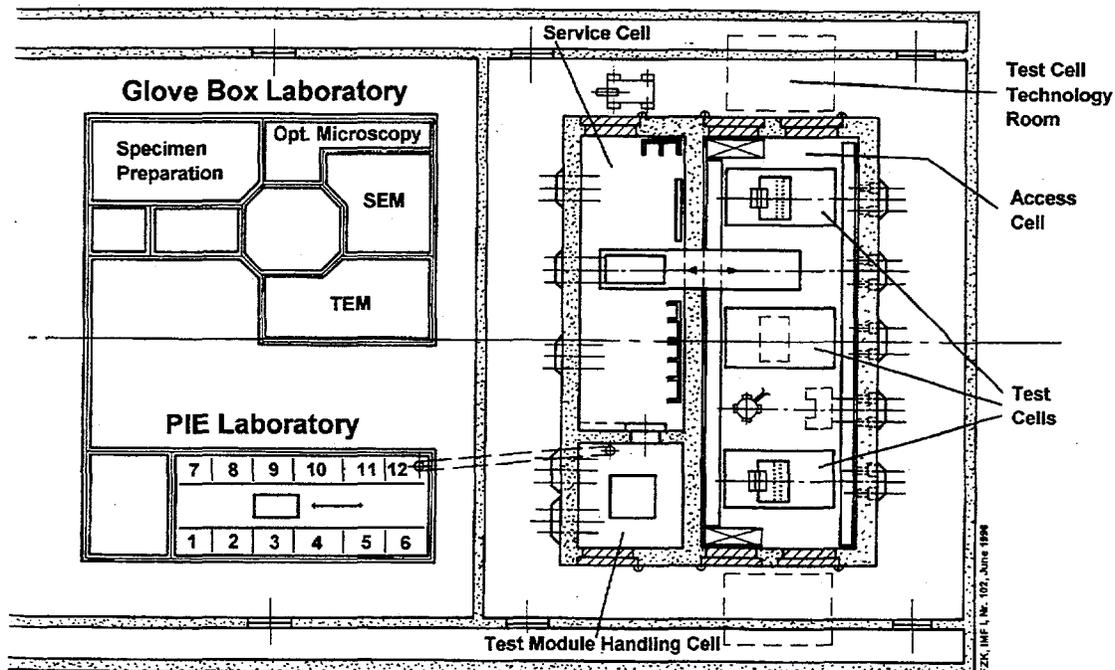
Plan view of the Test facilities with PIE Laboratory.
